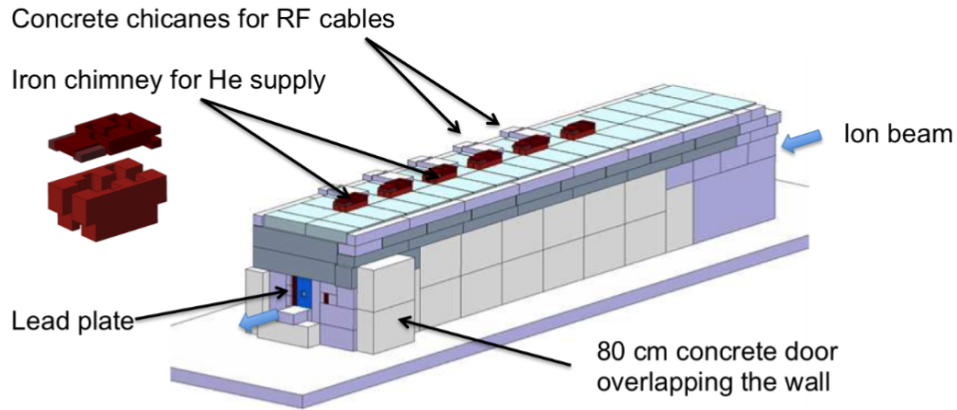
Shielding design for the HIE-ISOLDE post-accelerator.
